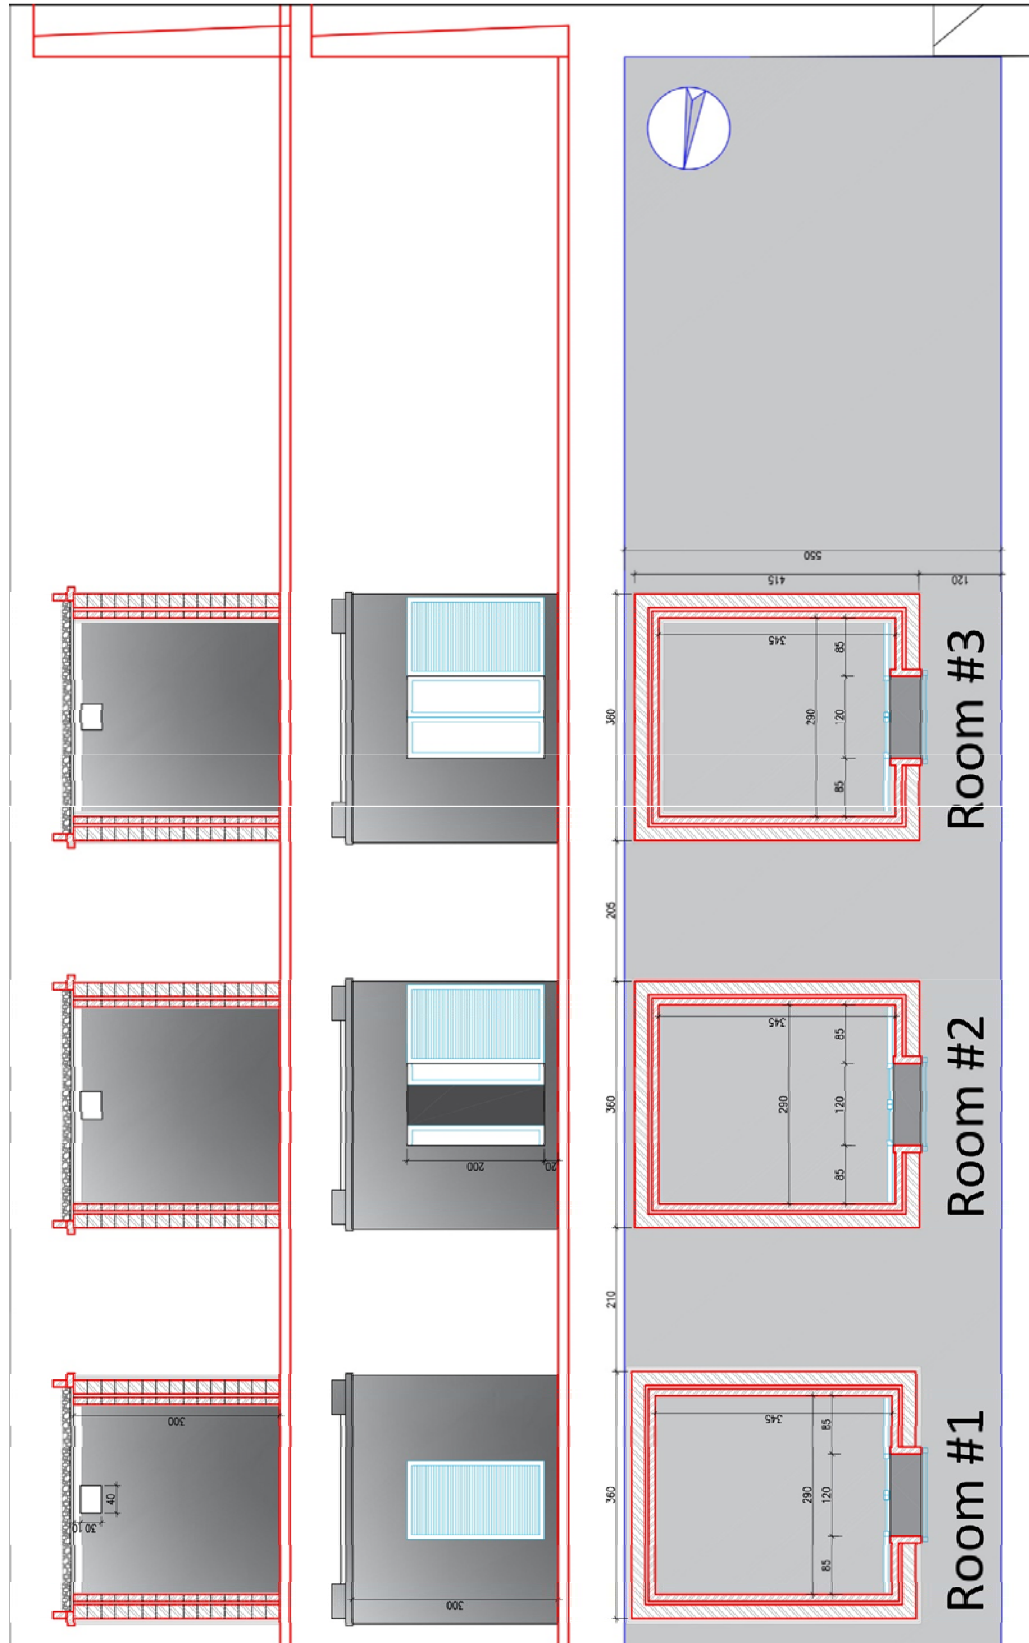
The technical maps, plans, sections and elevations of the three rooms
